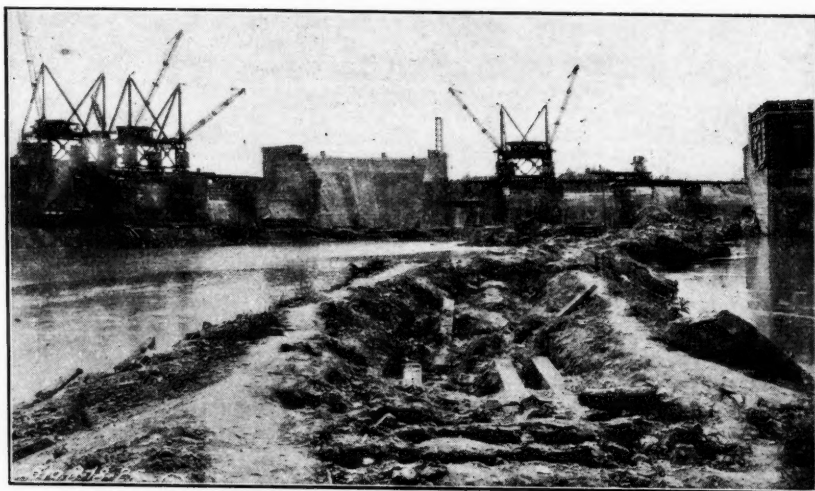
NEW SPILLWAY UNDER CONSTRUCTION, CATAWBA PLANT.
